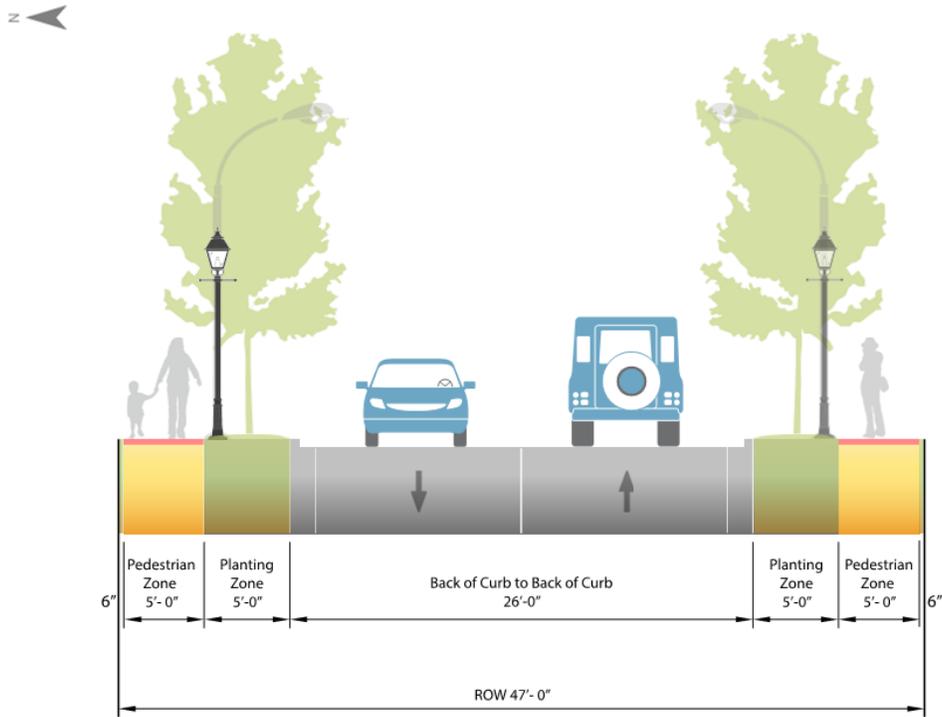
Proposed North Bryan Ave Complete Streets Cross Section
